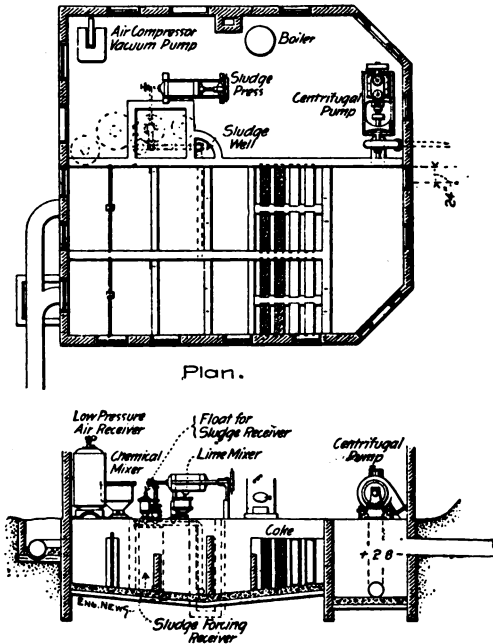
PLAN AND SECTION OF PURIFICATION WORKS.
